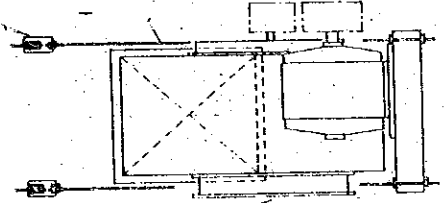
DETAIL OF DUCT WORK IN AIR CONDITIONER ROOM & POWER ROOM
